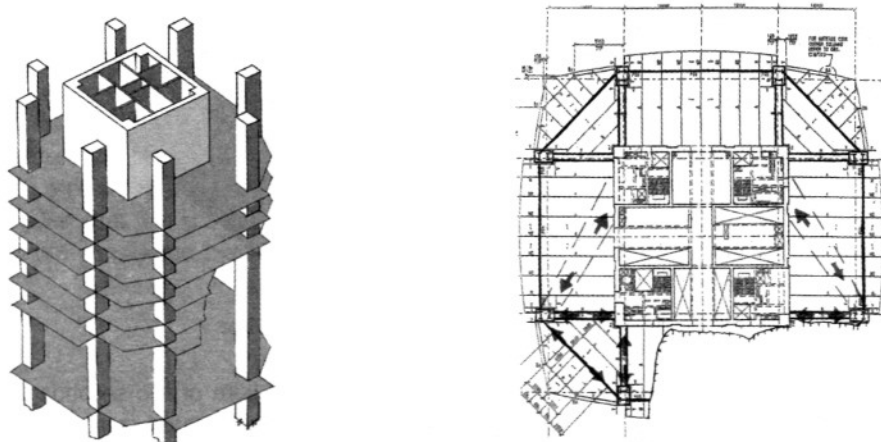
Removal of Floor Diaphragms and Column Restraint
